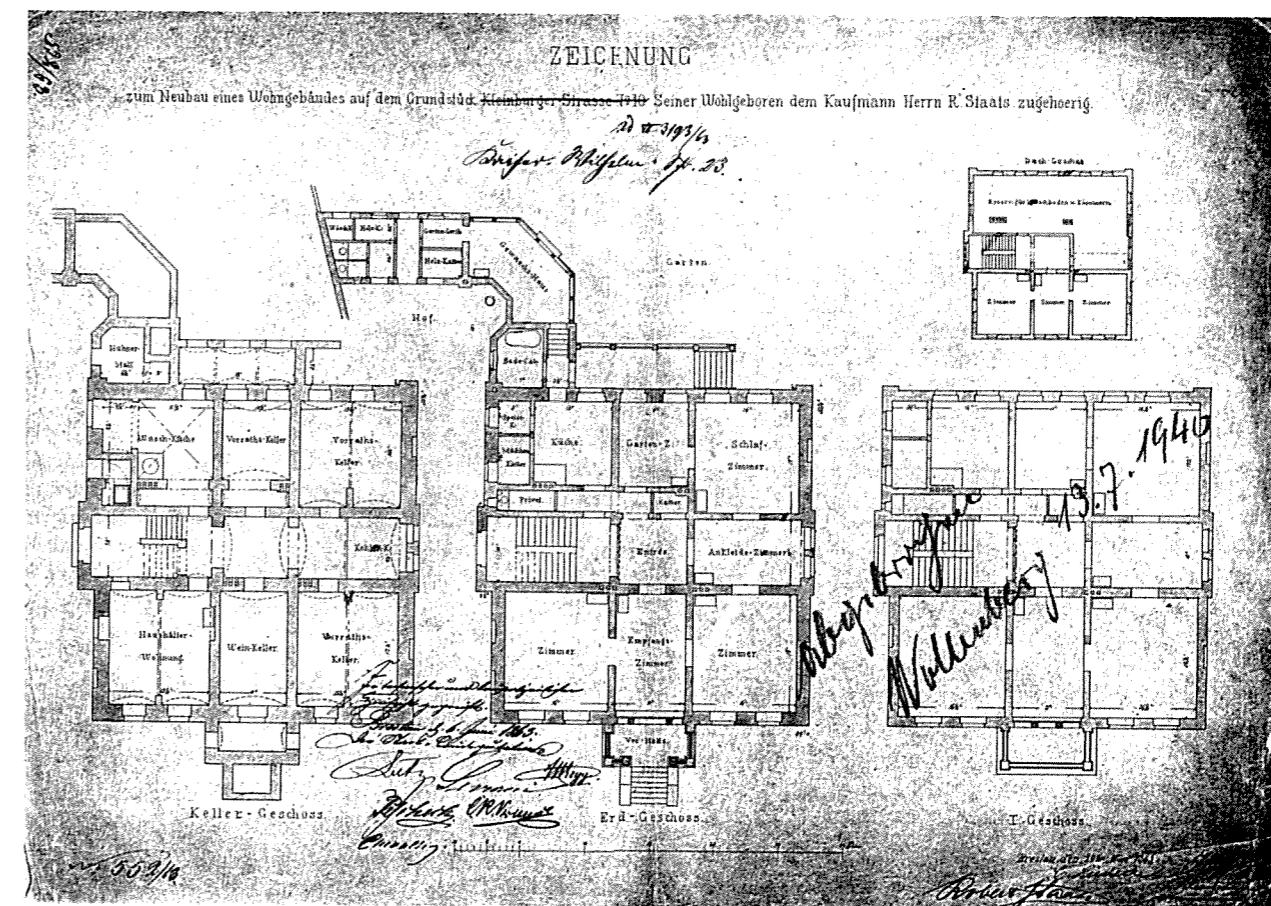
C. Luedecke: Villa Straat in Breslau, plan of cellar, ground- and first floor, 1863. Drawings collection, Museum of Architecture, Wrocław, Poland.
